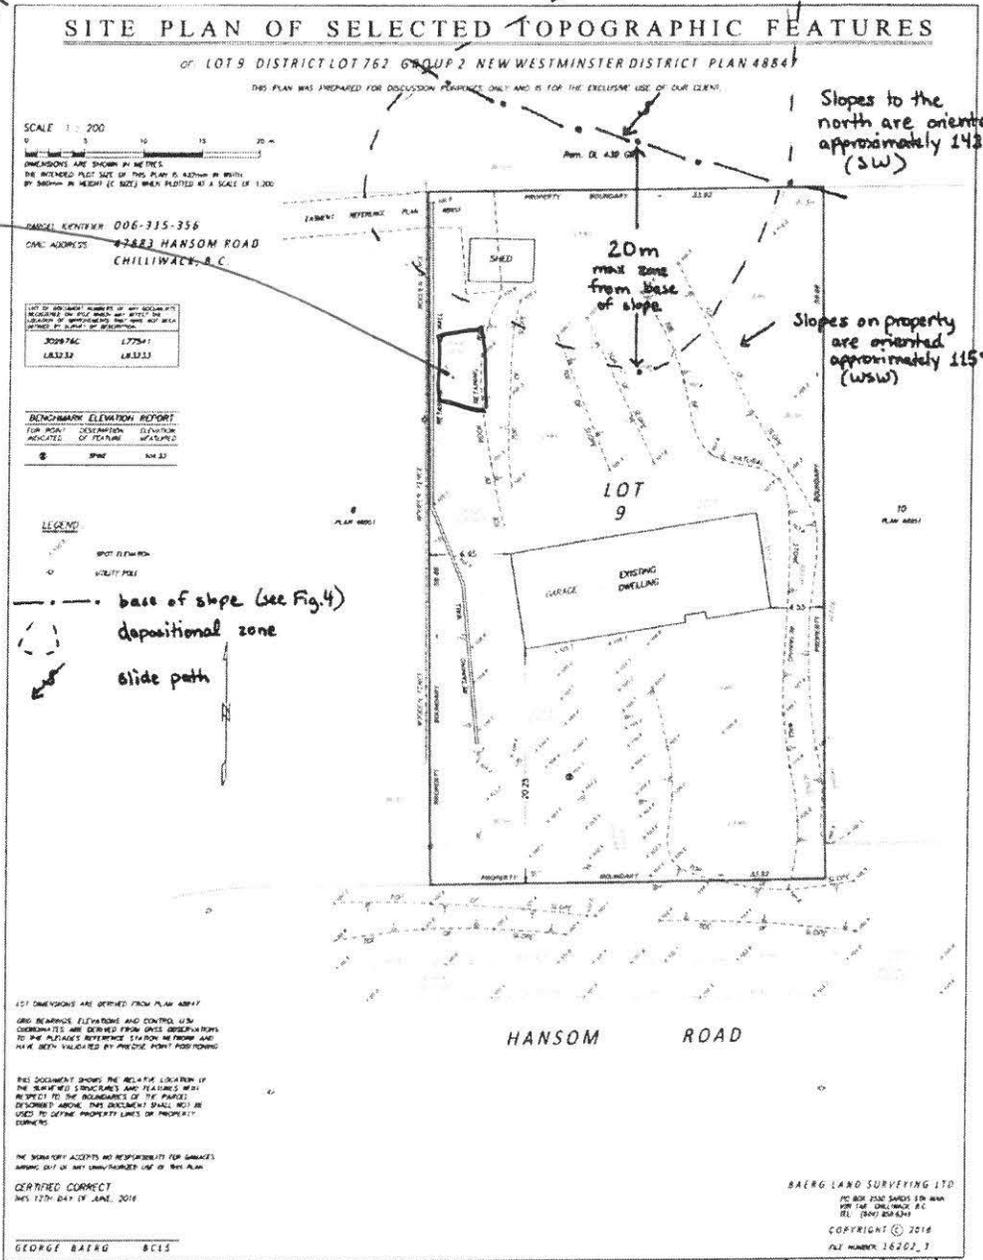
Scaled sketch showing potential debris deposition zone and slope orientations. Modified from a 2016 legal site and topographical survey.
